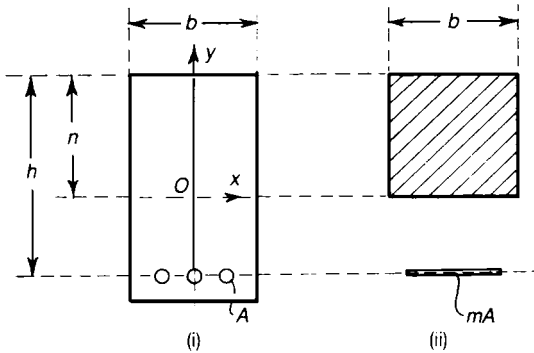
Simple rectangular concrete beam with reinforcing steel in the tension flange.
